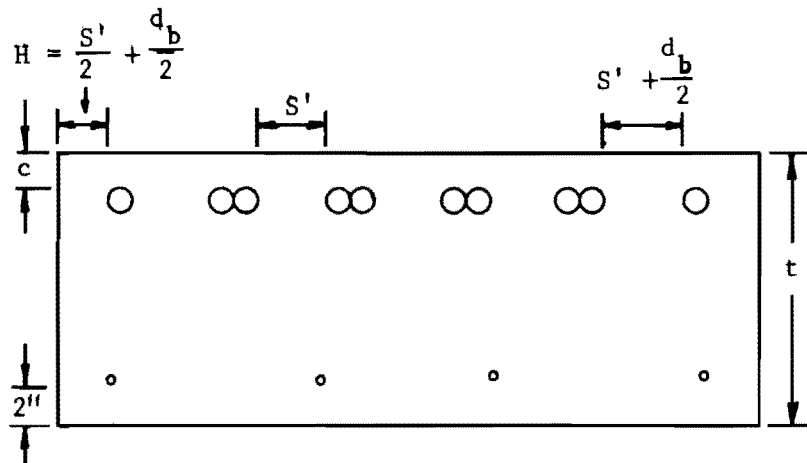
Typical cross section of #8 and #11 bar specimens with continuous edge bars (shown in testing position)
